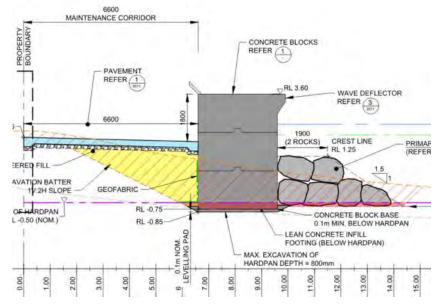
S3 (mass concrete block wall, 3 blocks high)
